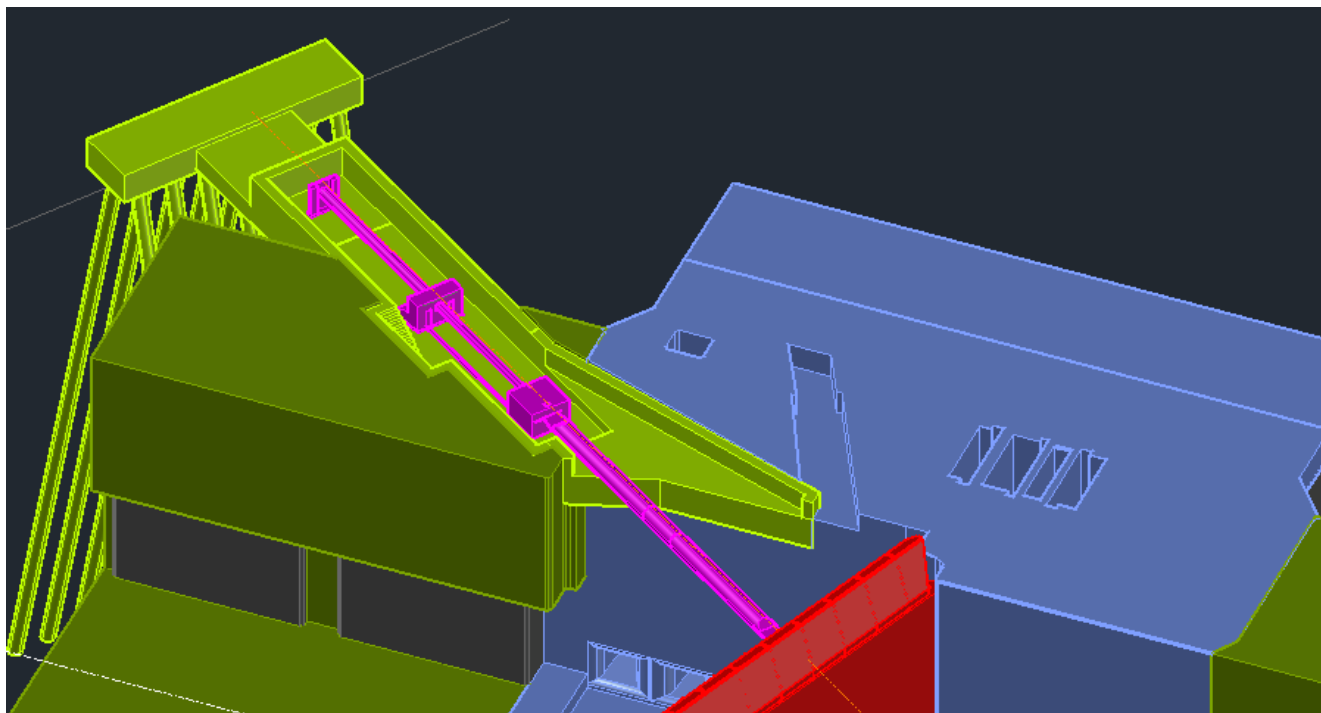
arrangement of prop link, cylinder, crosshead and piled foundation structure. The existing gate cylinder pit (to be infilled) is shown in blue to the right
